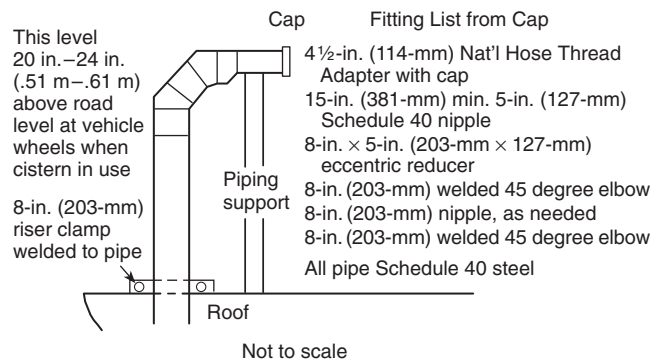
(g) Detail E — lower suction pipe. (Courtesy of New Boston Fire Department, New Boston, NH)
